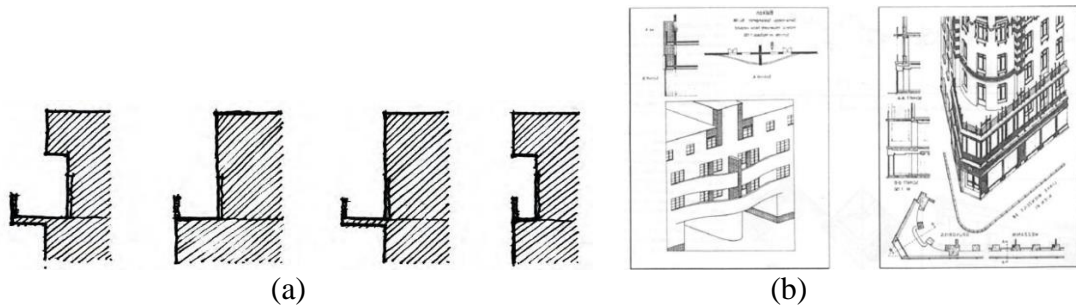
Balcony; an eaves and trough of building wall source; (b): Example of the salience windows, balconies and paches Example of the salience windows, balconies and paches (krier, 1983; 64).
